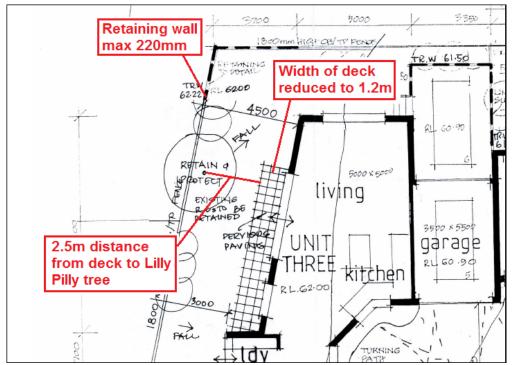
Plan showing retaining wall detail along rear boundary, and distance of Lilly Pilly from rear deck.
